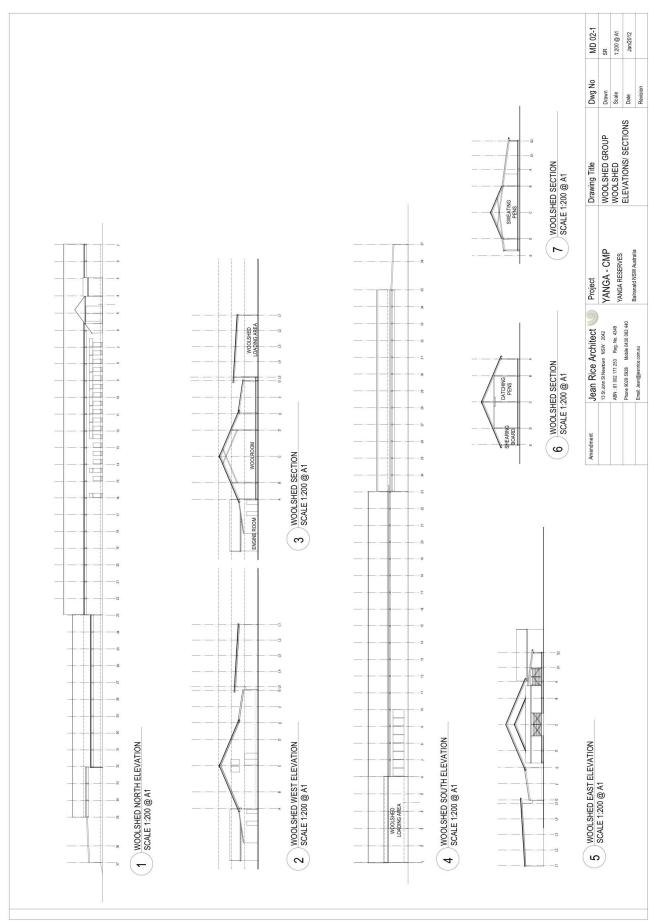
Woolshed Group Woolshed floor plan and elevations. This small scale plan shows the overall form of this building. Drawings on the following pages show the building section by section in detail. Jean Rice Architect, site assessment 2009.
